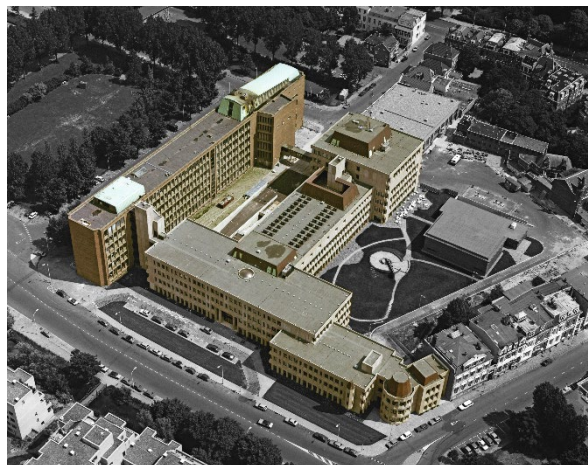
Aerial photo of the police headquarters in The Hague, highlighting the buildings with a precast concrete facade, Haags Gemeentearchief, Delta-Phot, 1980.
